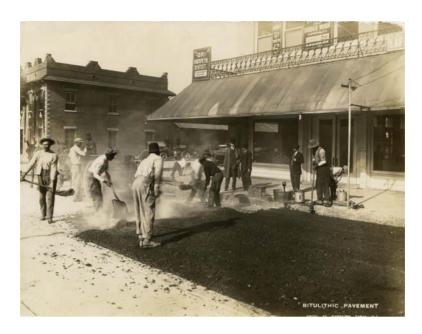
Bitulithic pavement placement process. Tampa, Florida (1920s.)
